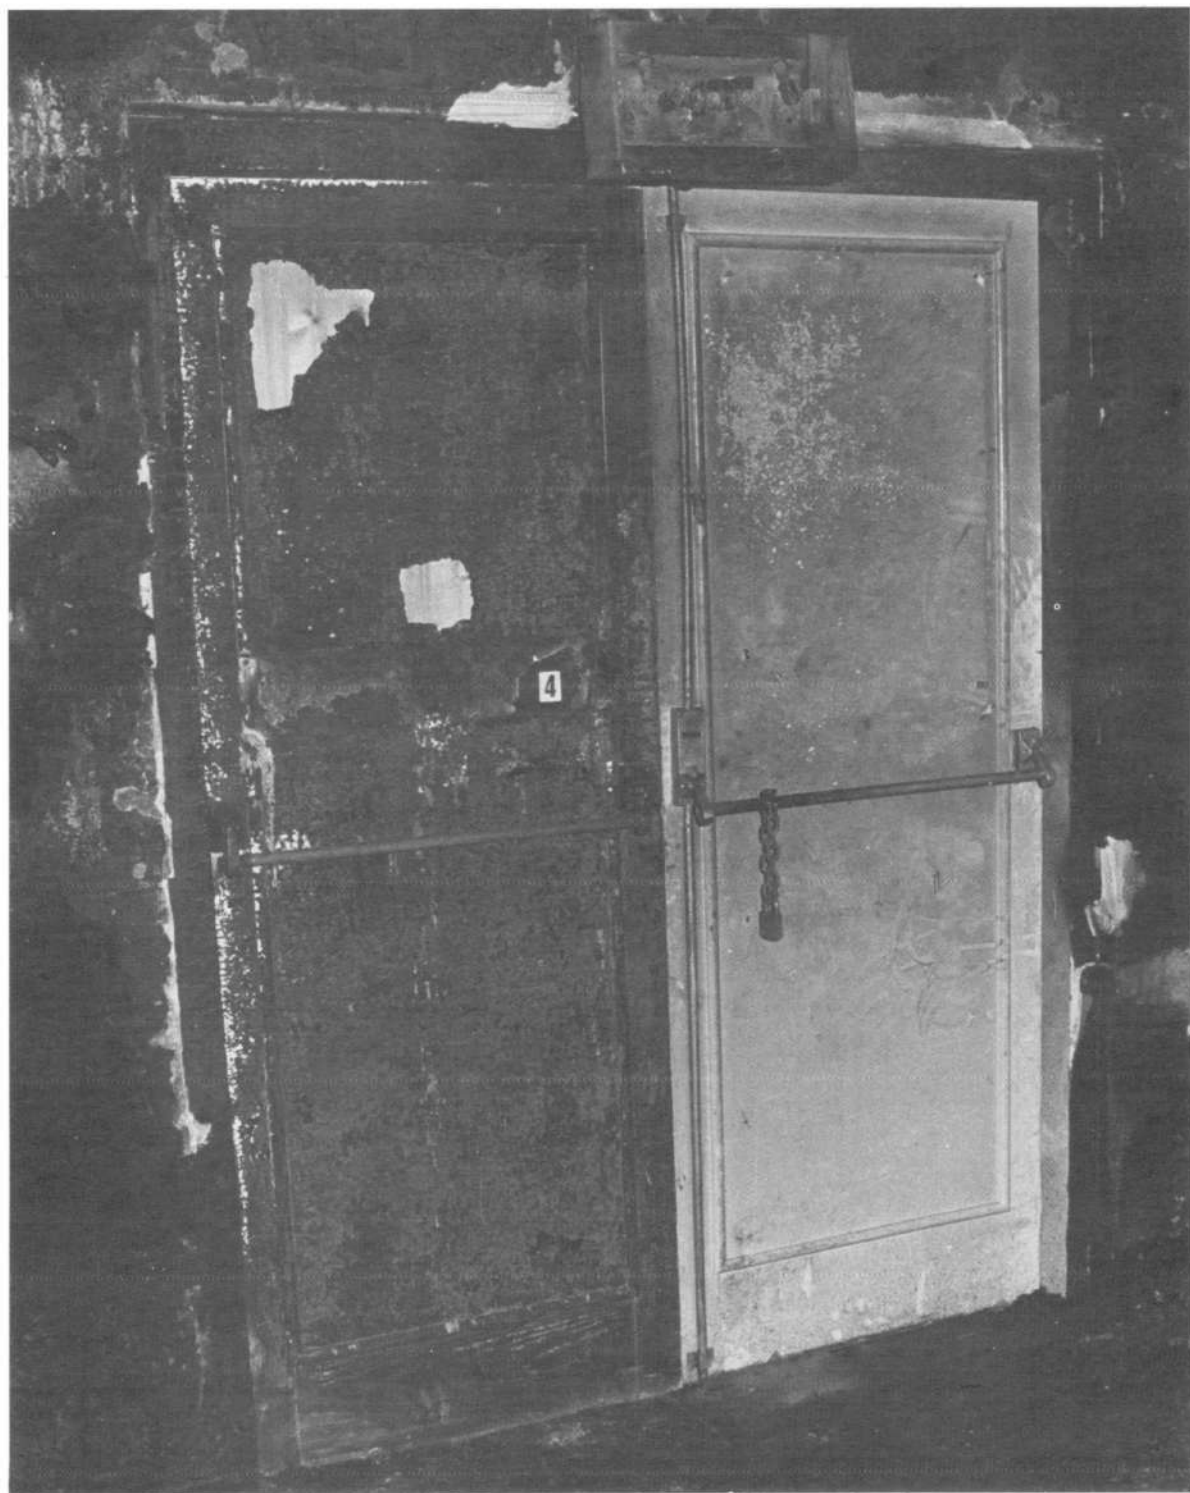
Internal view of Exit 4, showing left-hand leaf badly fire-damaged.
